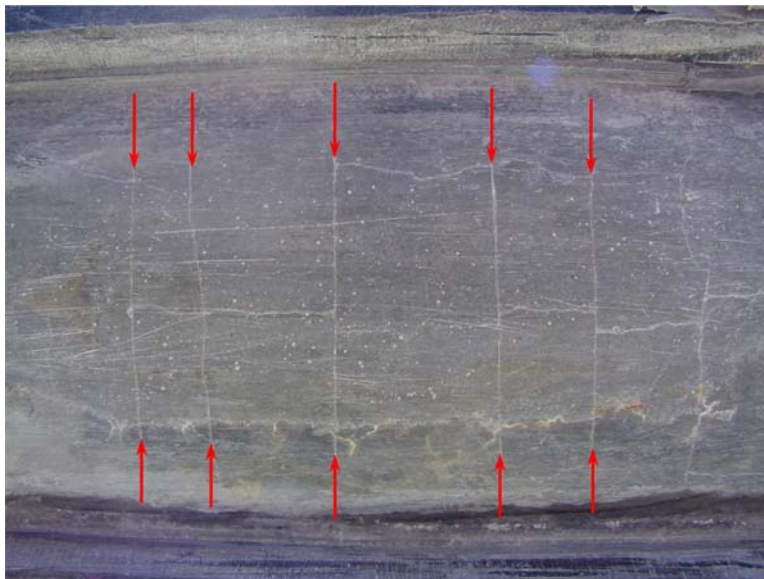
Grout Surface Defect and Corrosion on Spacer Wire – Specimen 1
